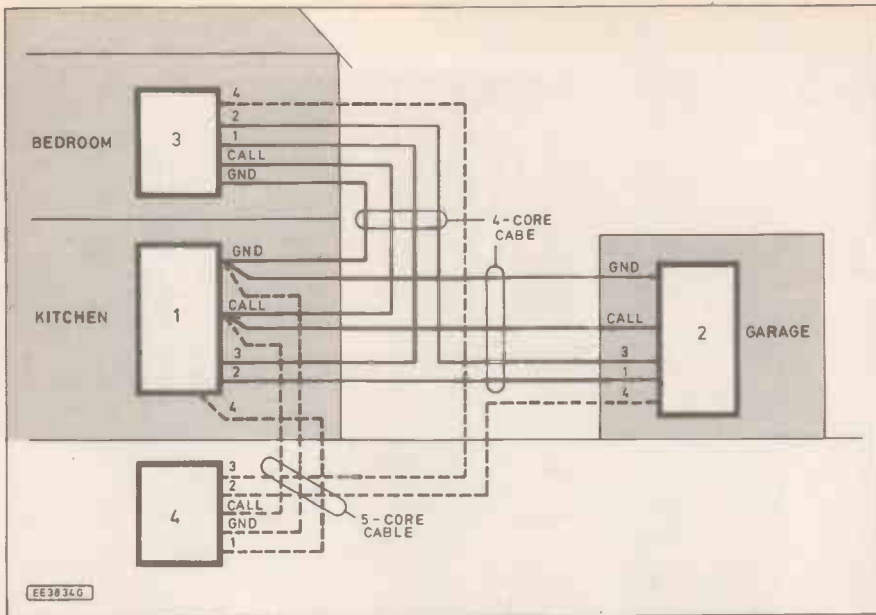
Typical wiring set-up for a three/four station layout in a home.
